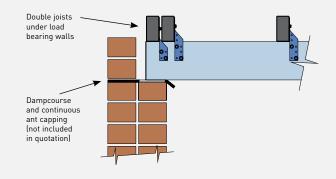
PERIMETER BEARERS PARALLEL TO WALL
